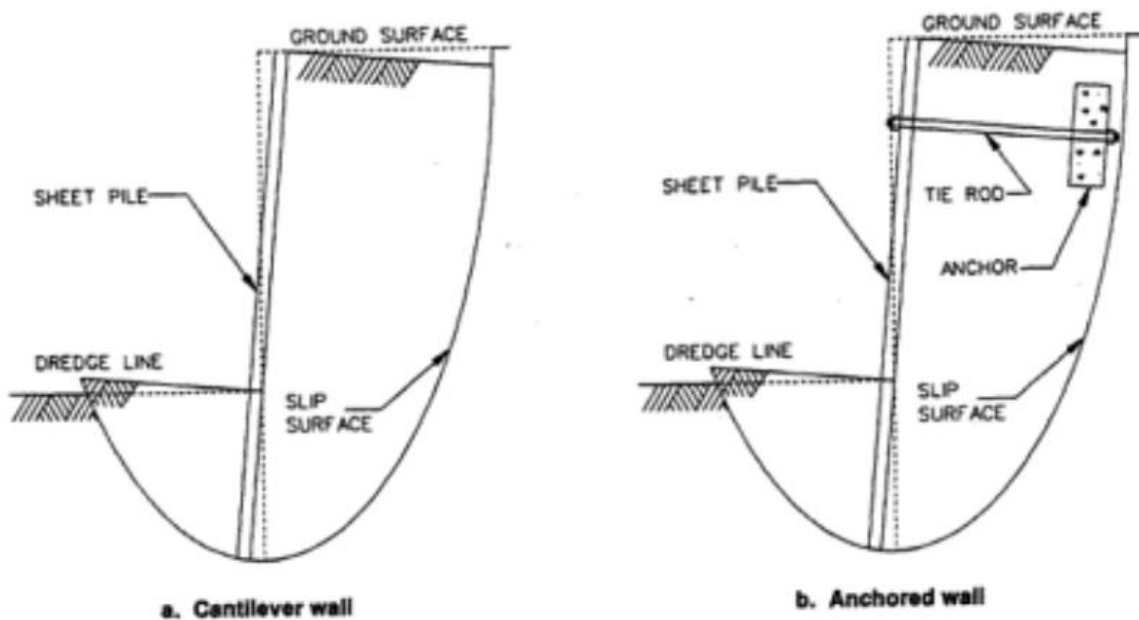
the deep-seated failure of cantilever and anchored sheet piles [29].
